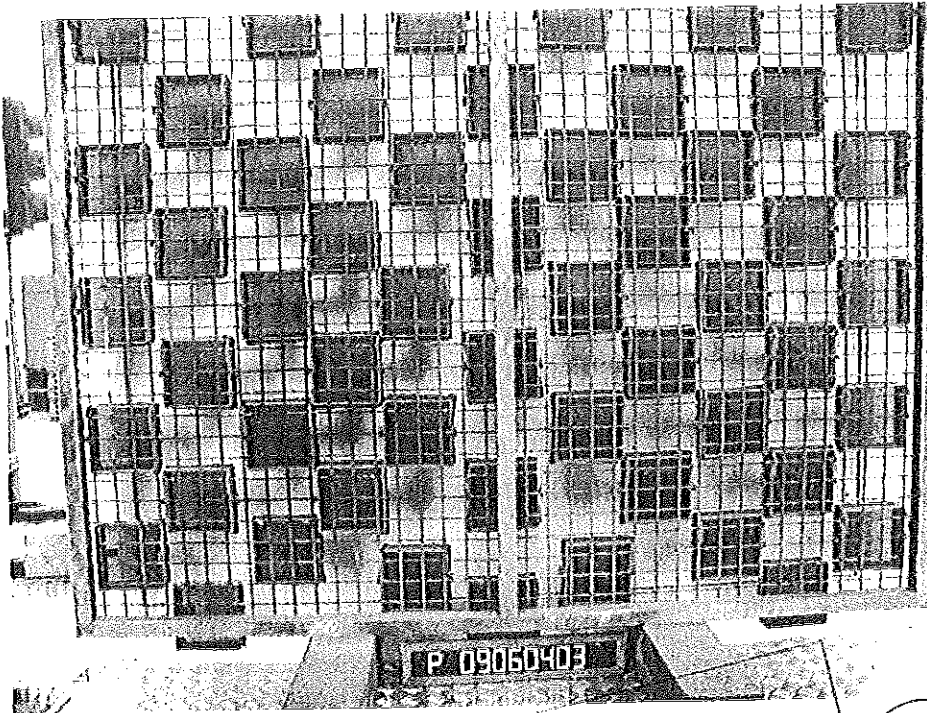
Rear view of the test object with indicators after test no. 090604-03
